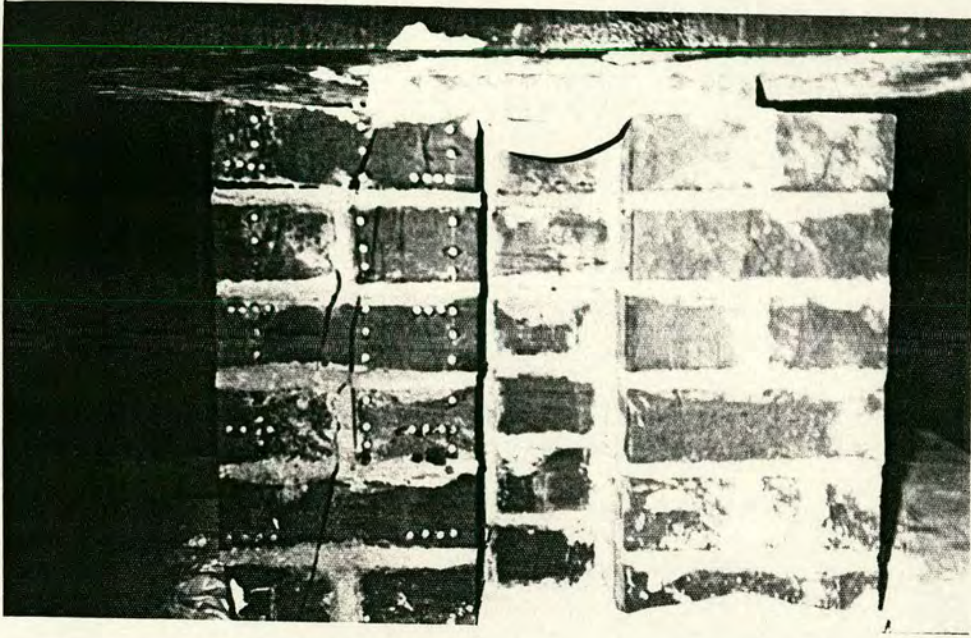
Typical failure mode and crack pattern for open pocket prisms
